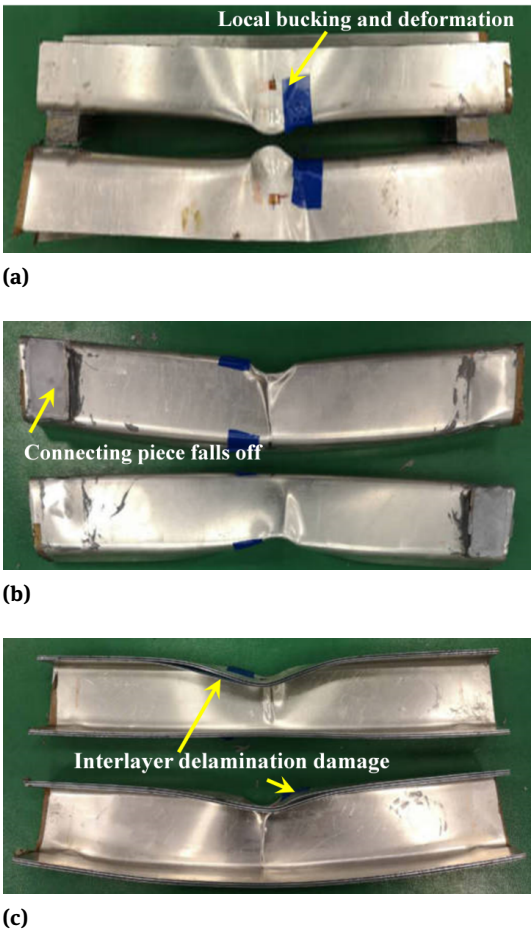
Failure modes of double-channel CARALL beams: (a) Local buckling and deformation of the upper flange and web; (b) connecting pieces fall off; and (c) interlayer delamination damage of upper flange.
